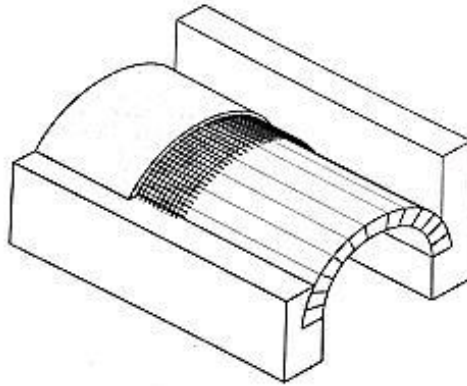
Reinforced concrete jacketing at the extrados of the vault
